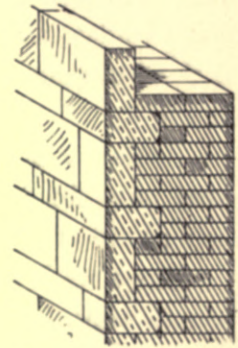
Brick Wall with Ashlar Facing having Alternate Bond-courses.
